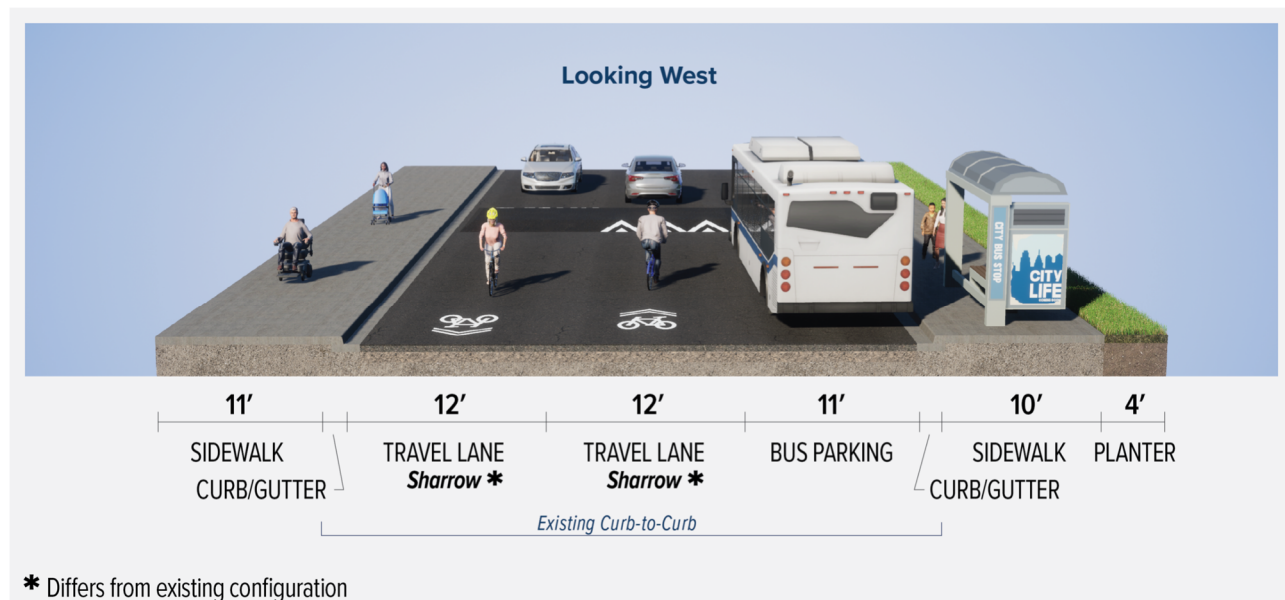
ALTERNATIVE 1 BETWEEN 3RD STREET AND 4TH STREET
